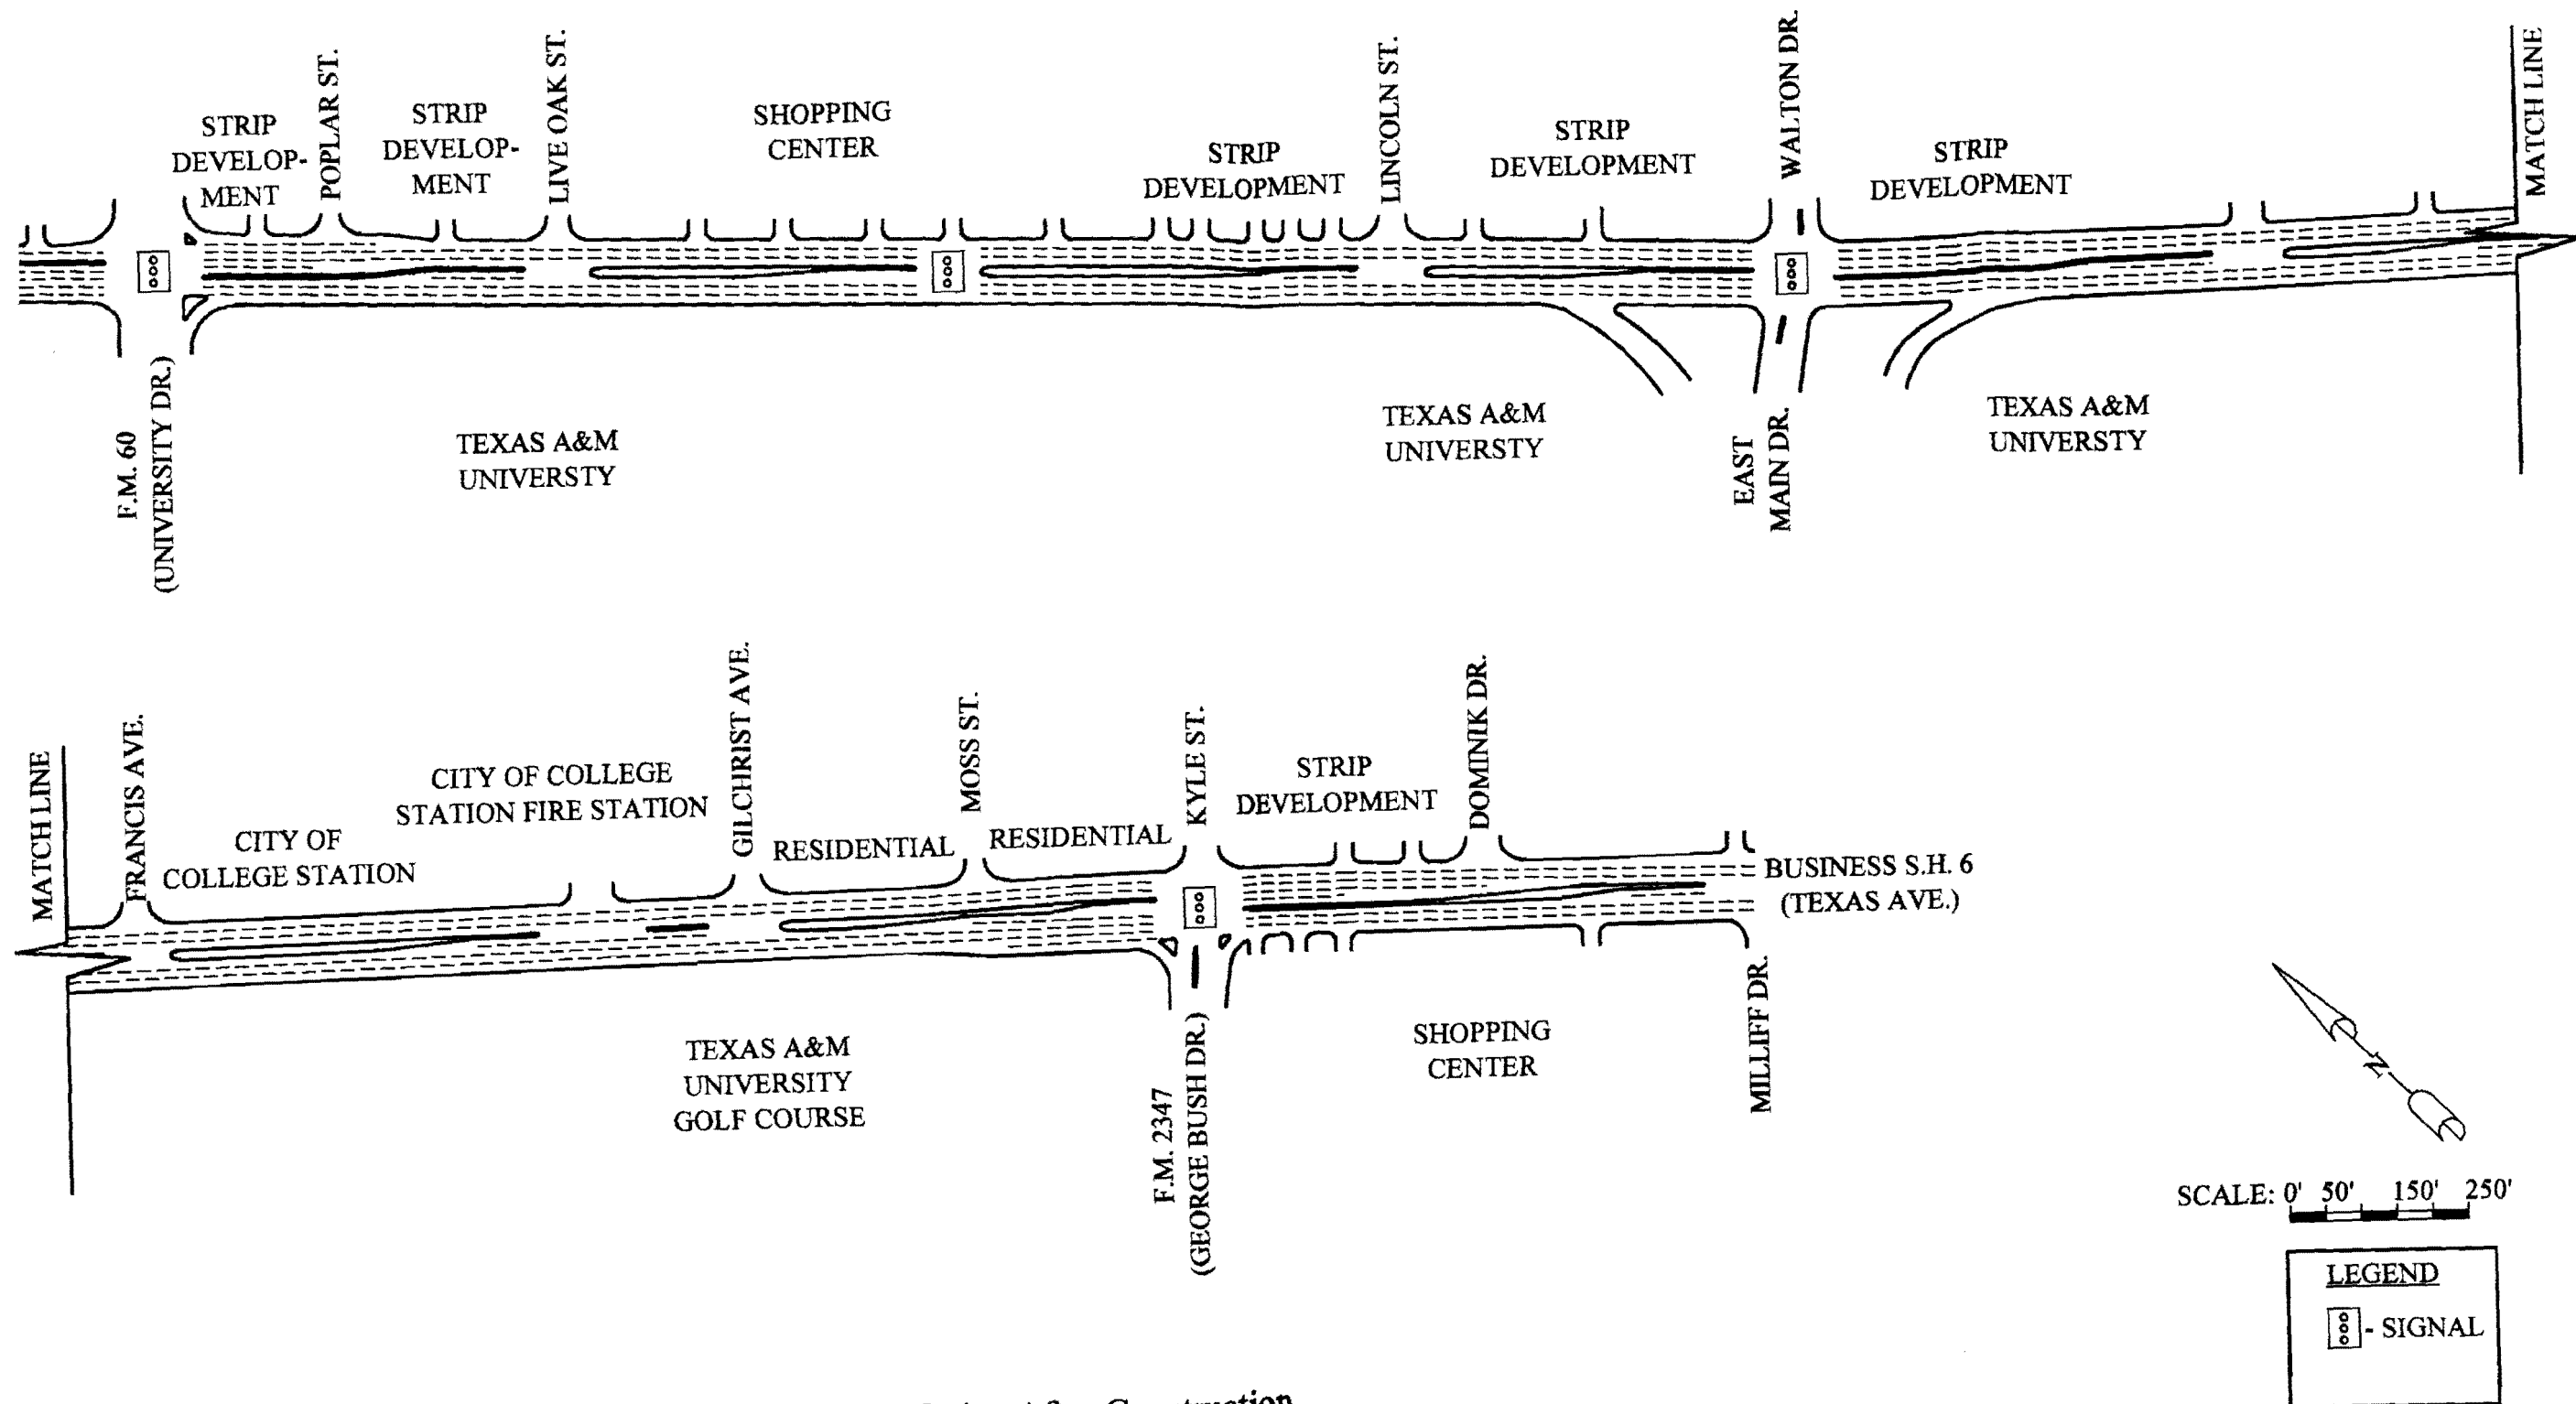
Texas Avenue Corridor North of Dominik Drive After Construction
